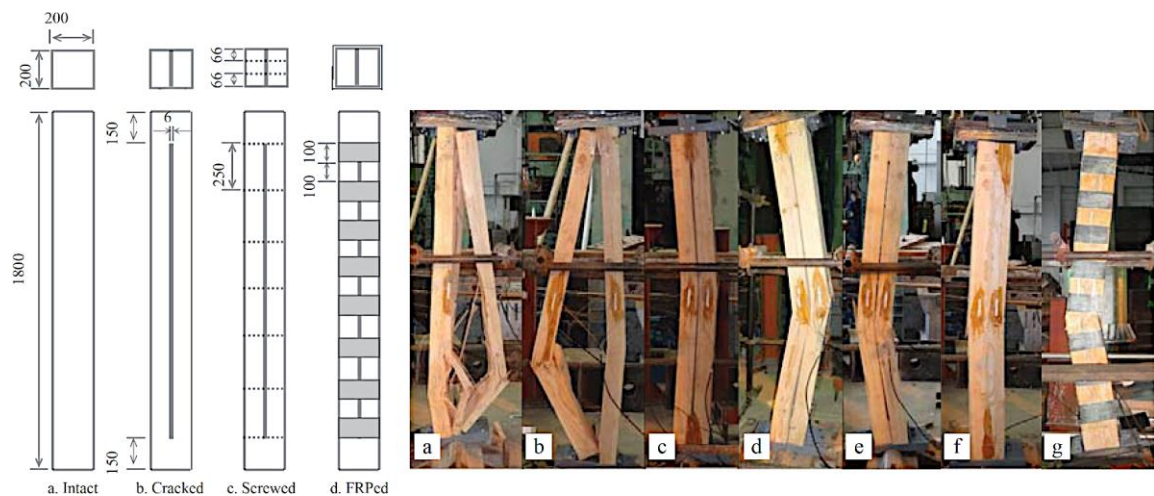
Reinforcement schemes (dimensions in mm) and failed columns (Song et al. (2012)).
